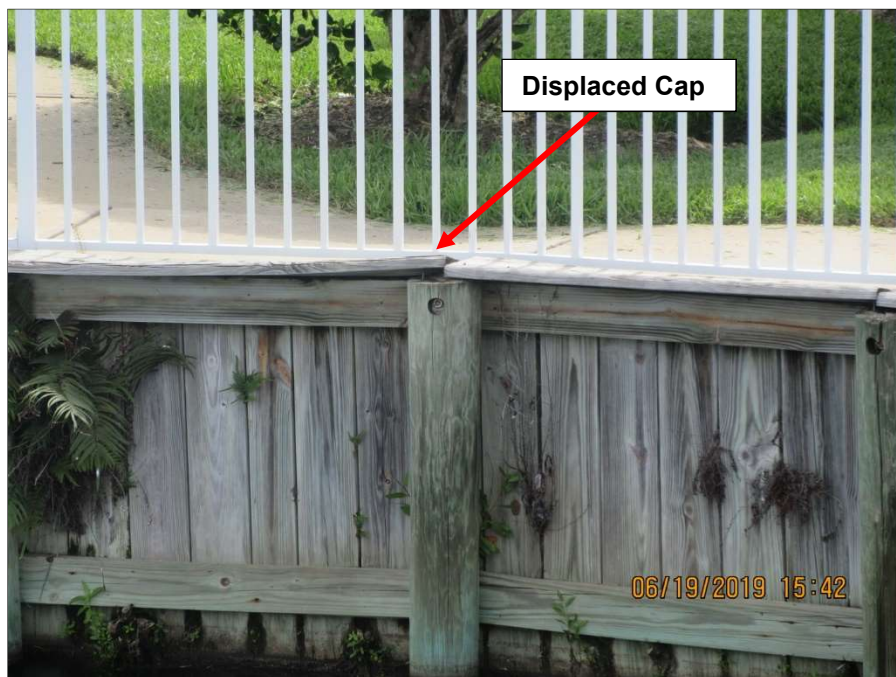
Vegetation growing on retaining wall and displaced boards at wall #3
